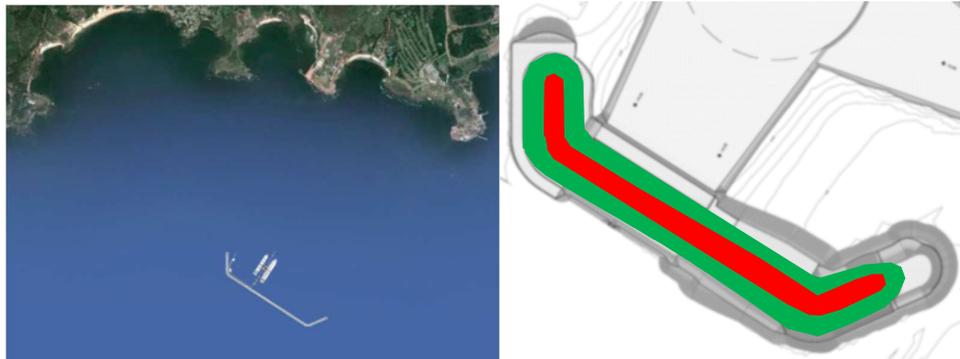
Location of the project (left) and approximate layout of the required scour protection layer (right): breakwater in red; scour protection layer in green.
